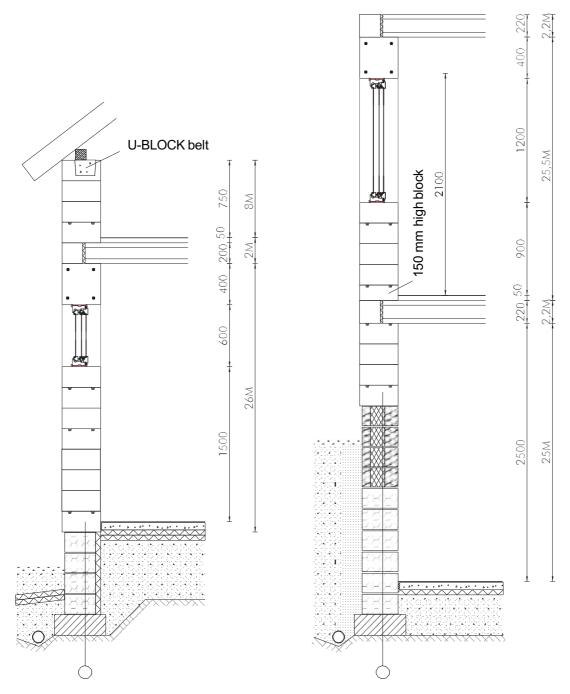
a. Wall vertical module measurement on bauroc ECOTERM + exterior wall
